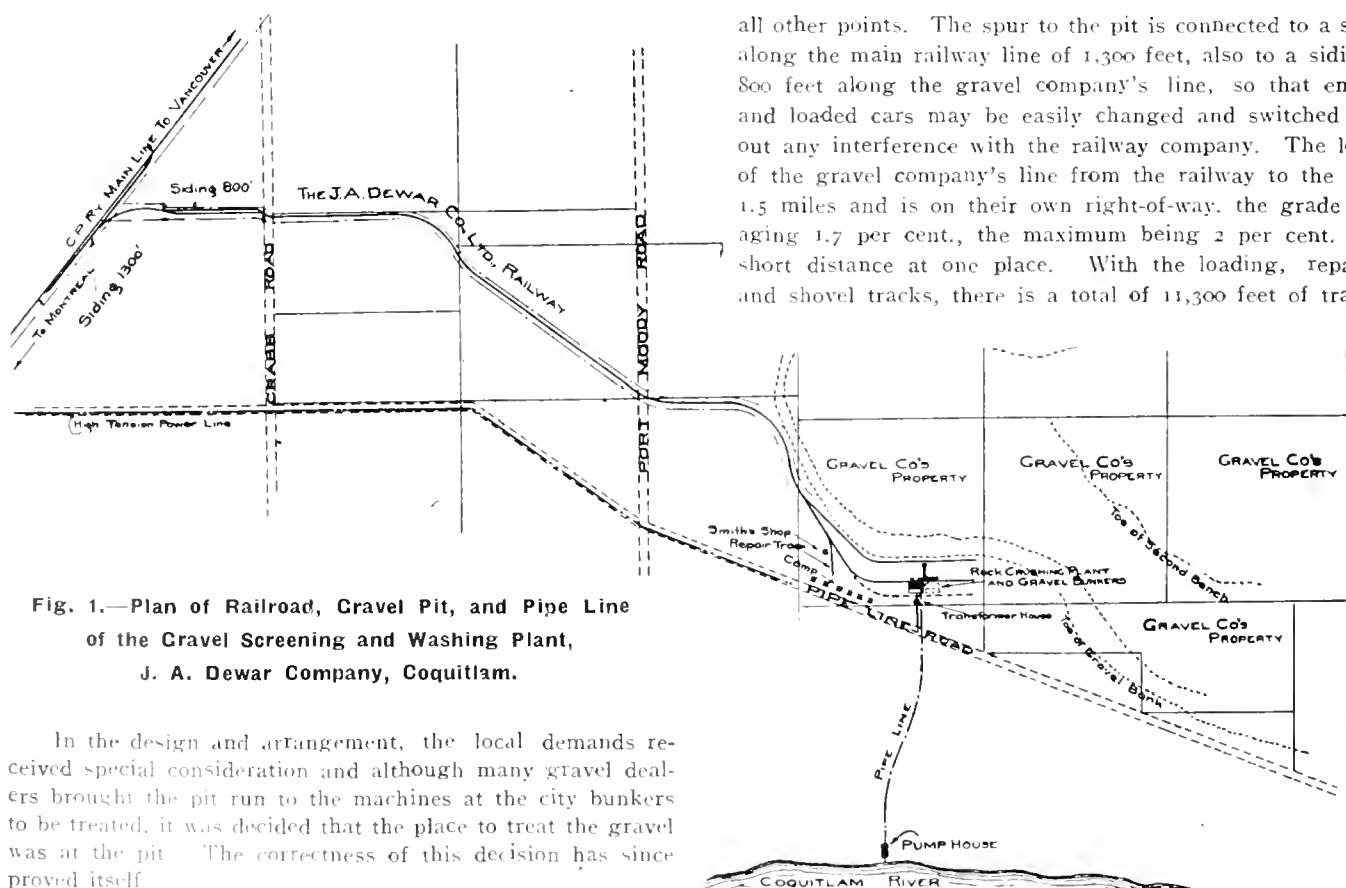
Plan of Railroad, Gravel Pit, and Pipe Line of the Gravel Screening and Washing Plant, J. A. Dewar Company, Coquitlam.
